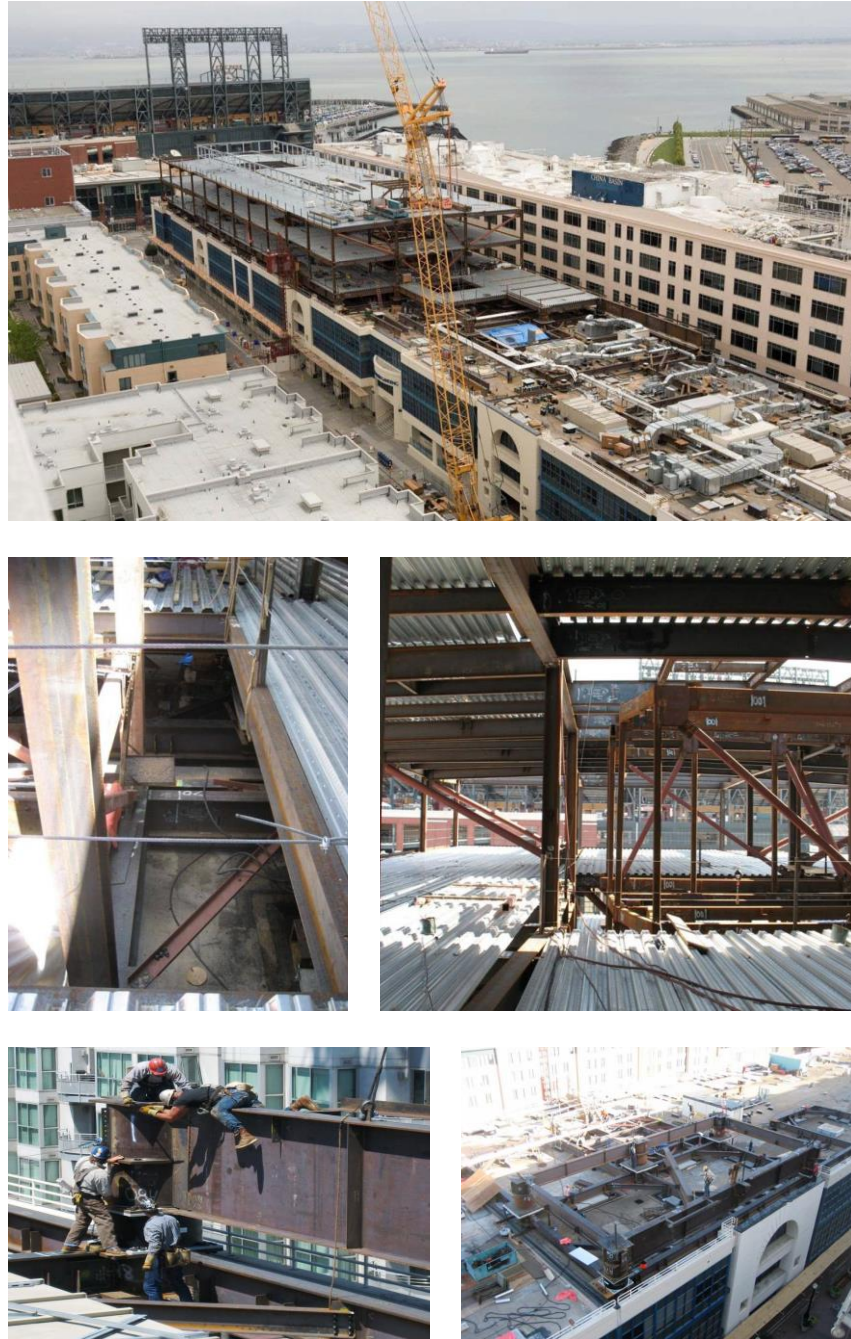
(a) elevation under construction, (b) – (c) view of the seismic joints, (d) – (e) steel beam installation
